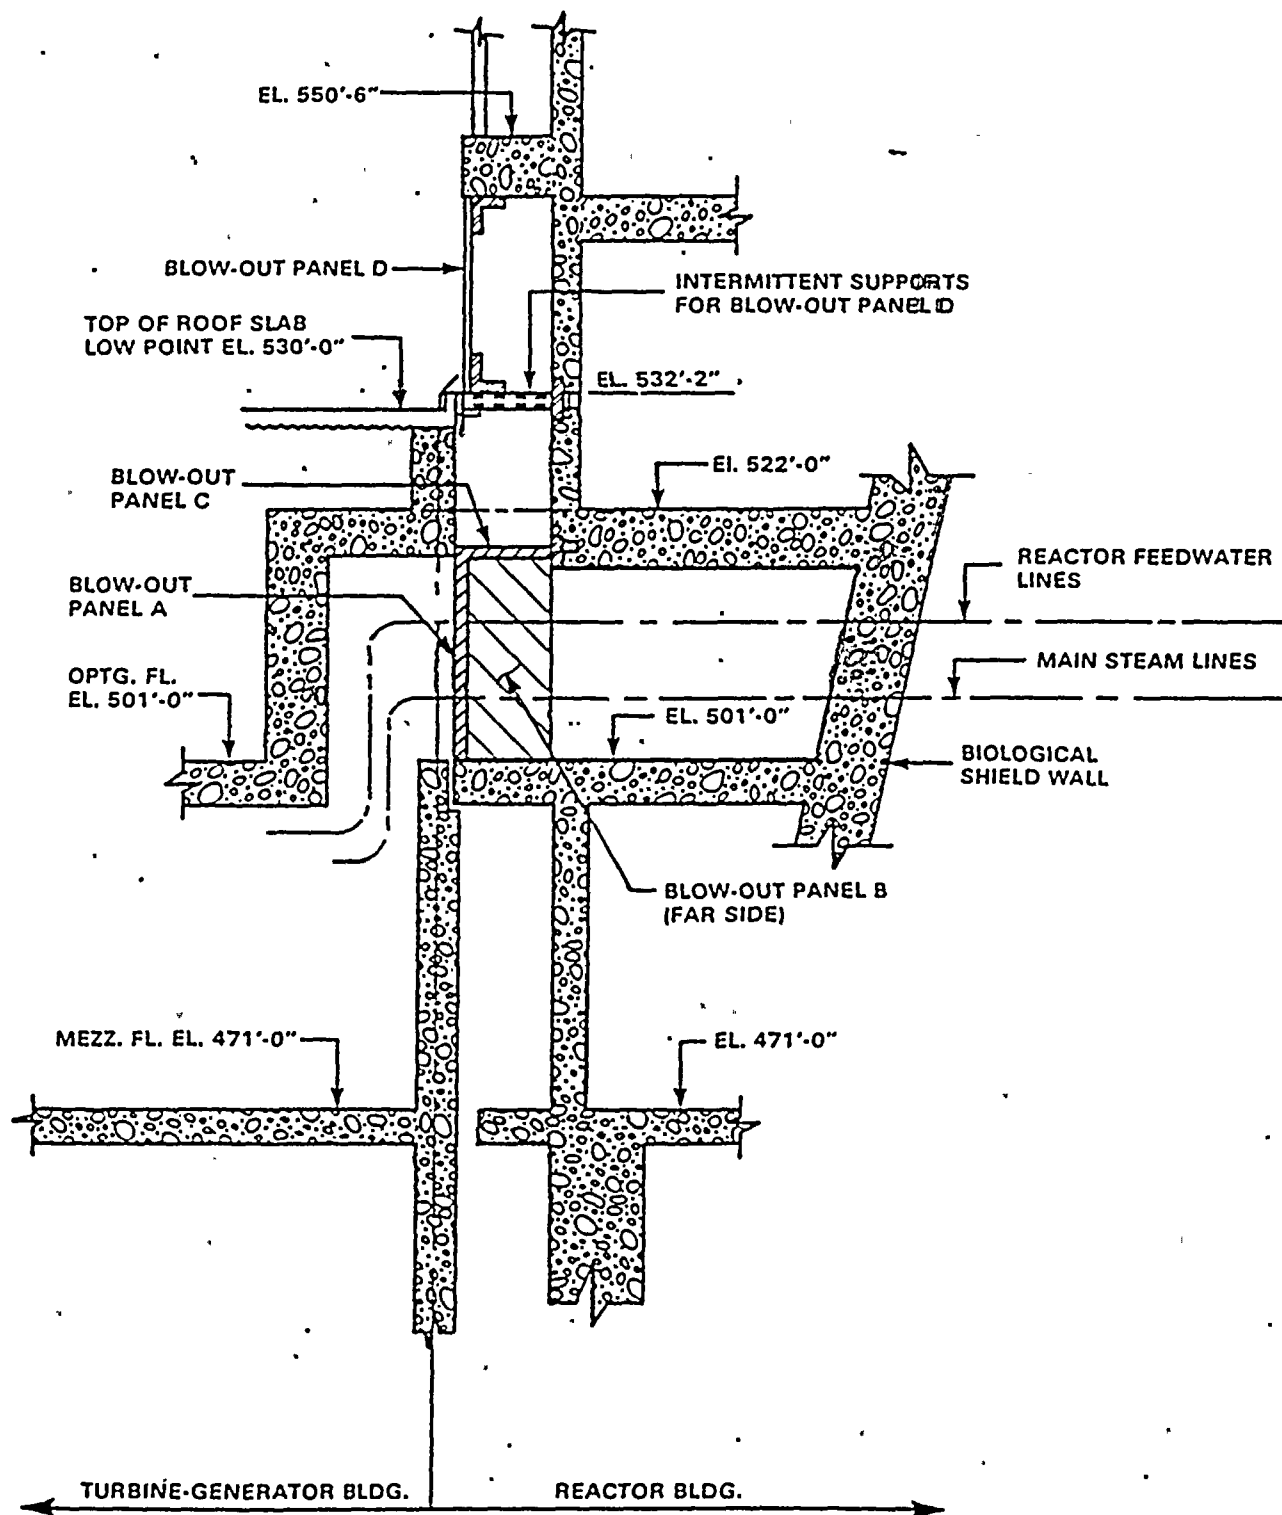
MAIN STEAM TUNNEL, VENTWAY AND TUNNEL EXTENSION
